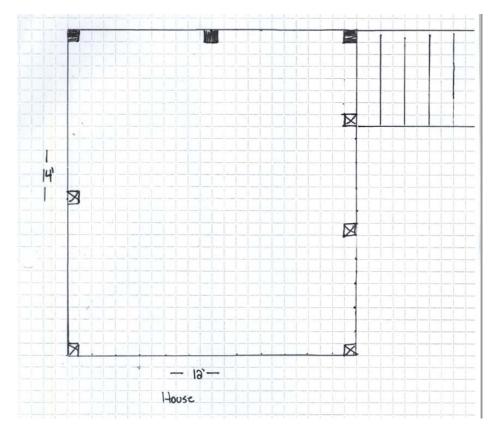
A plan showing the dimensions of the existing deck. The applicant is looking to replace the existing deck with a new deck within the same footprint.
